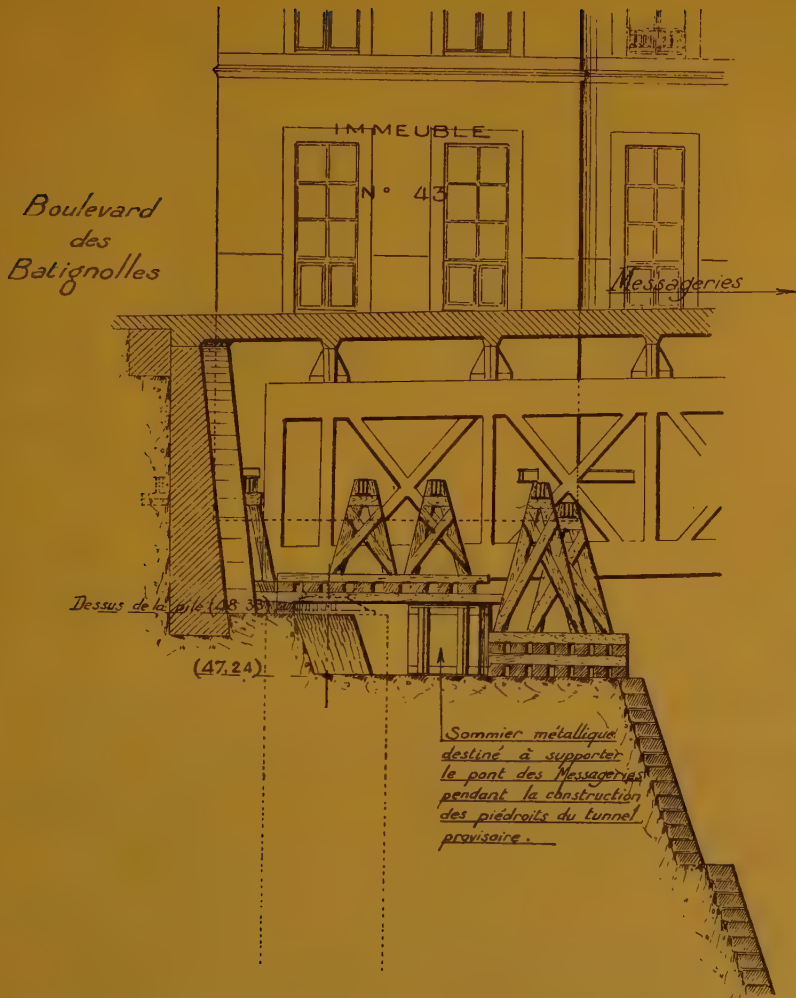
Supporting No. 43, Boulevard des Batignolles, by means of girders.
